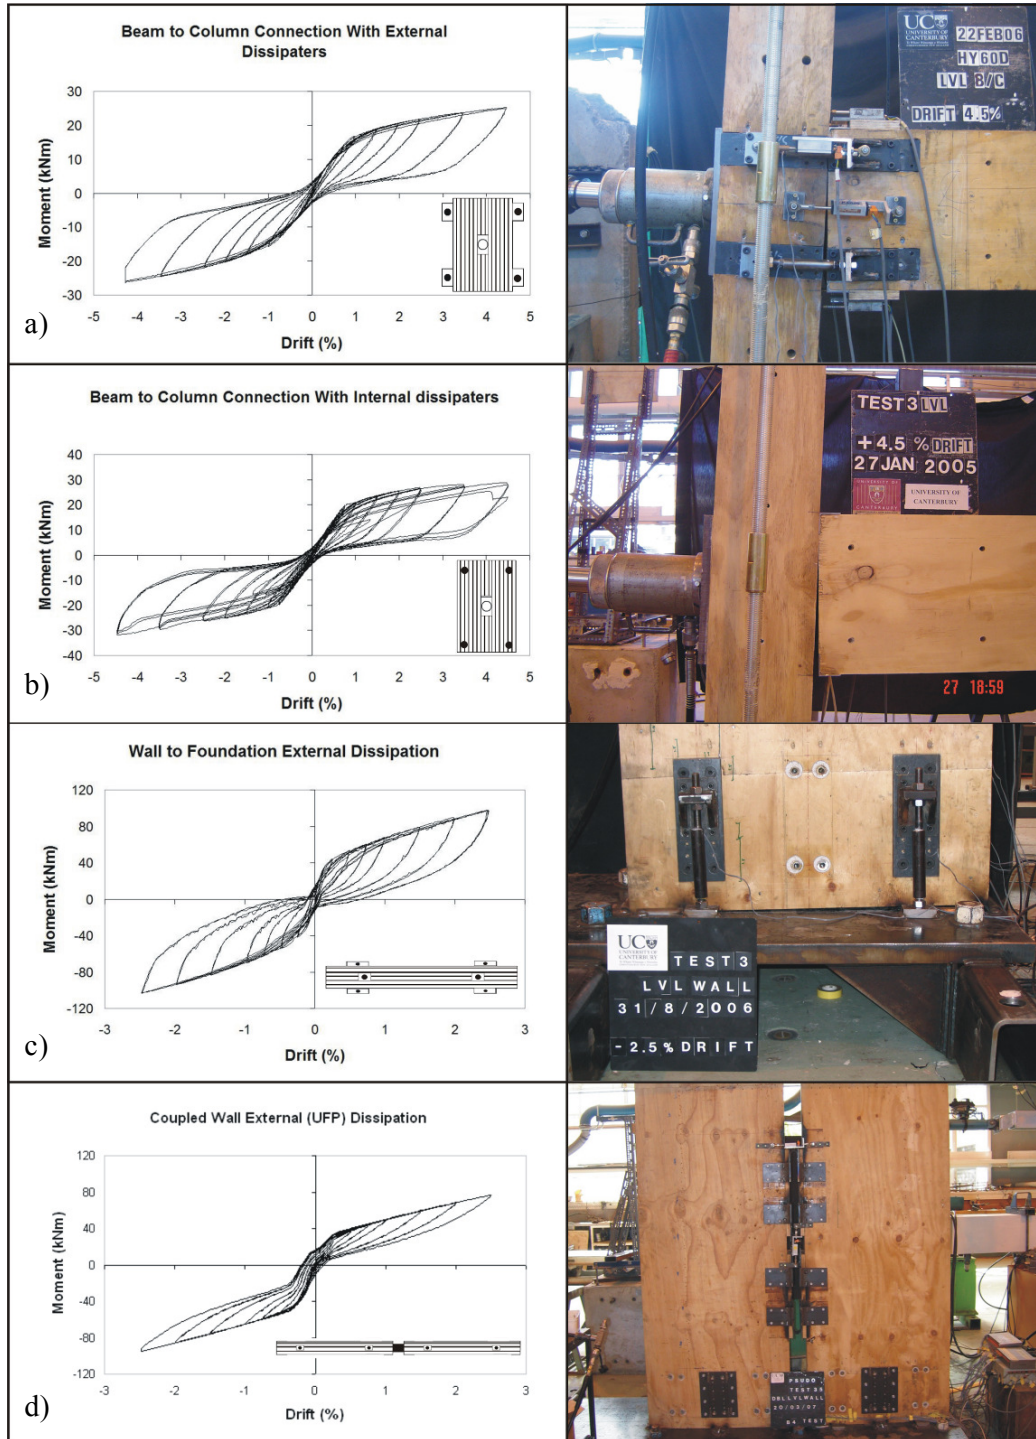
a) Beam-column test with external dissipation b) Beam-column test with internal dissipation c) Wall-foundation test with external dissipation d) coupled wall with external UFP dissipation
